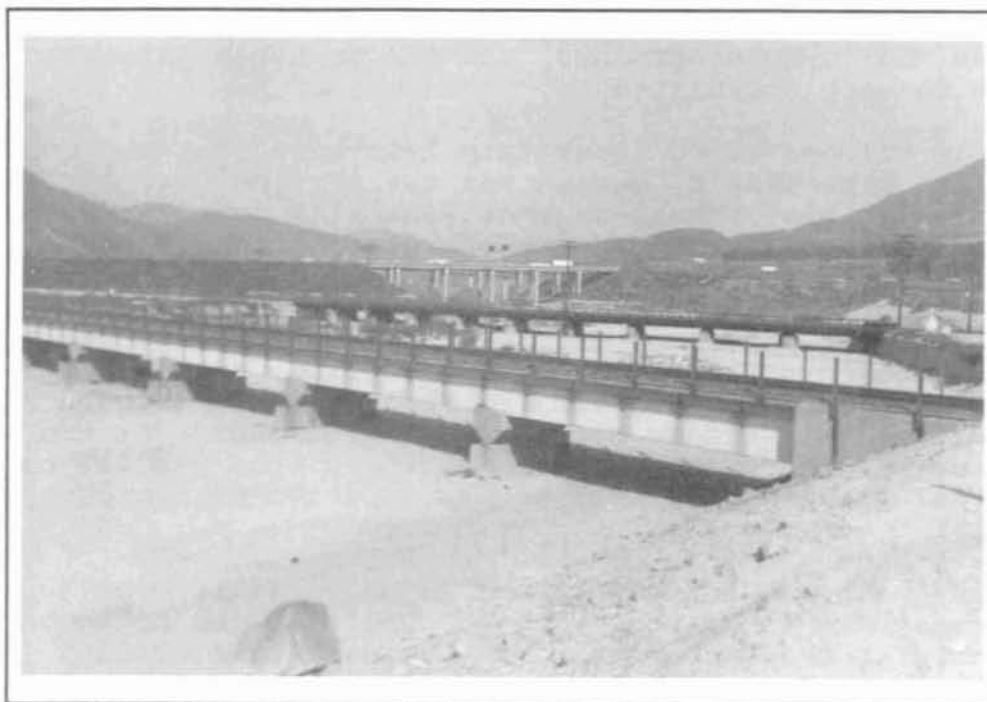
Railroad Bridges In Cajon Wash (I-15 Bridge In The Background)
